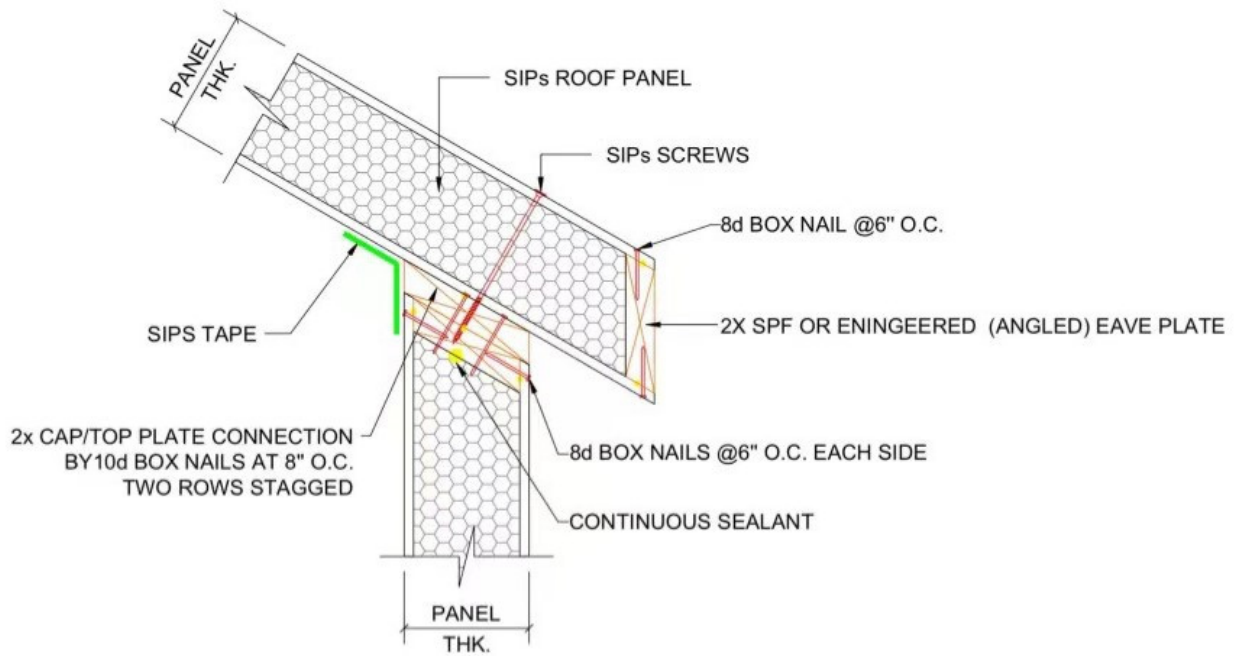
WALL PANEL TO ROOF PANEL WITH BEVELED TOP PLATE
